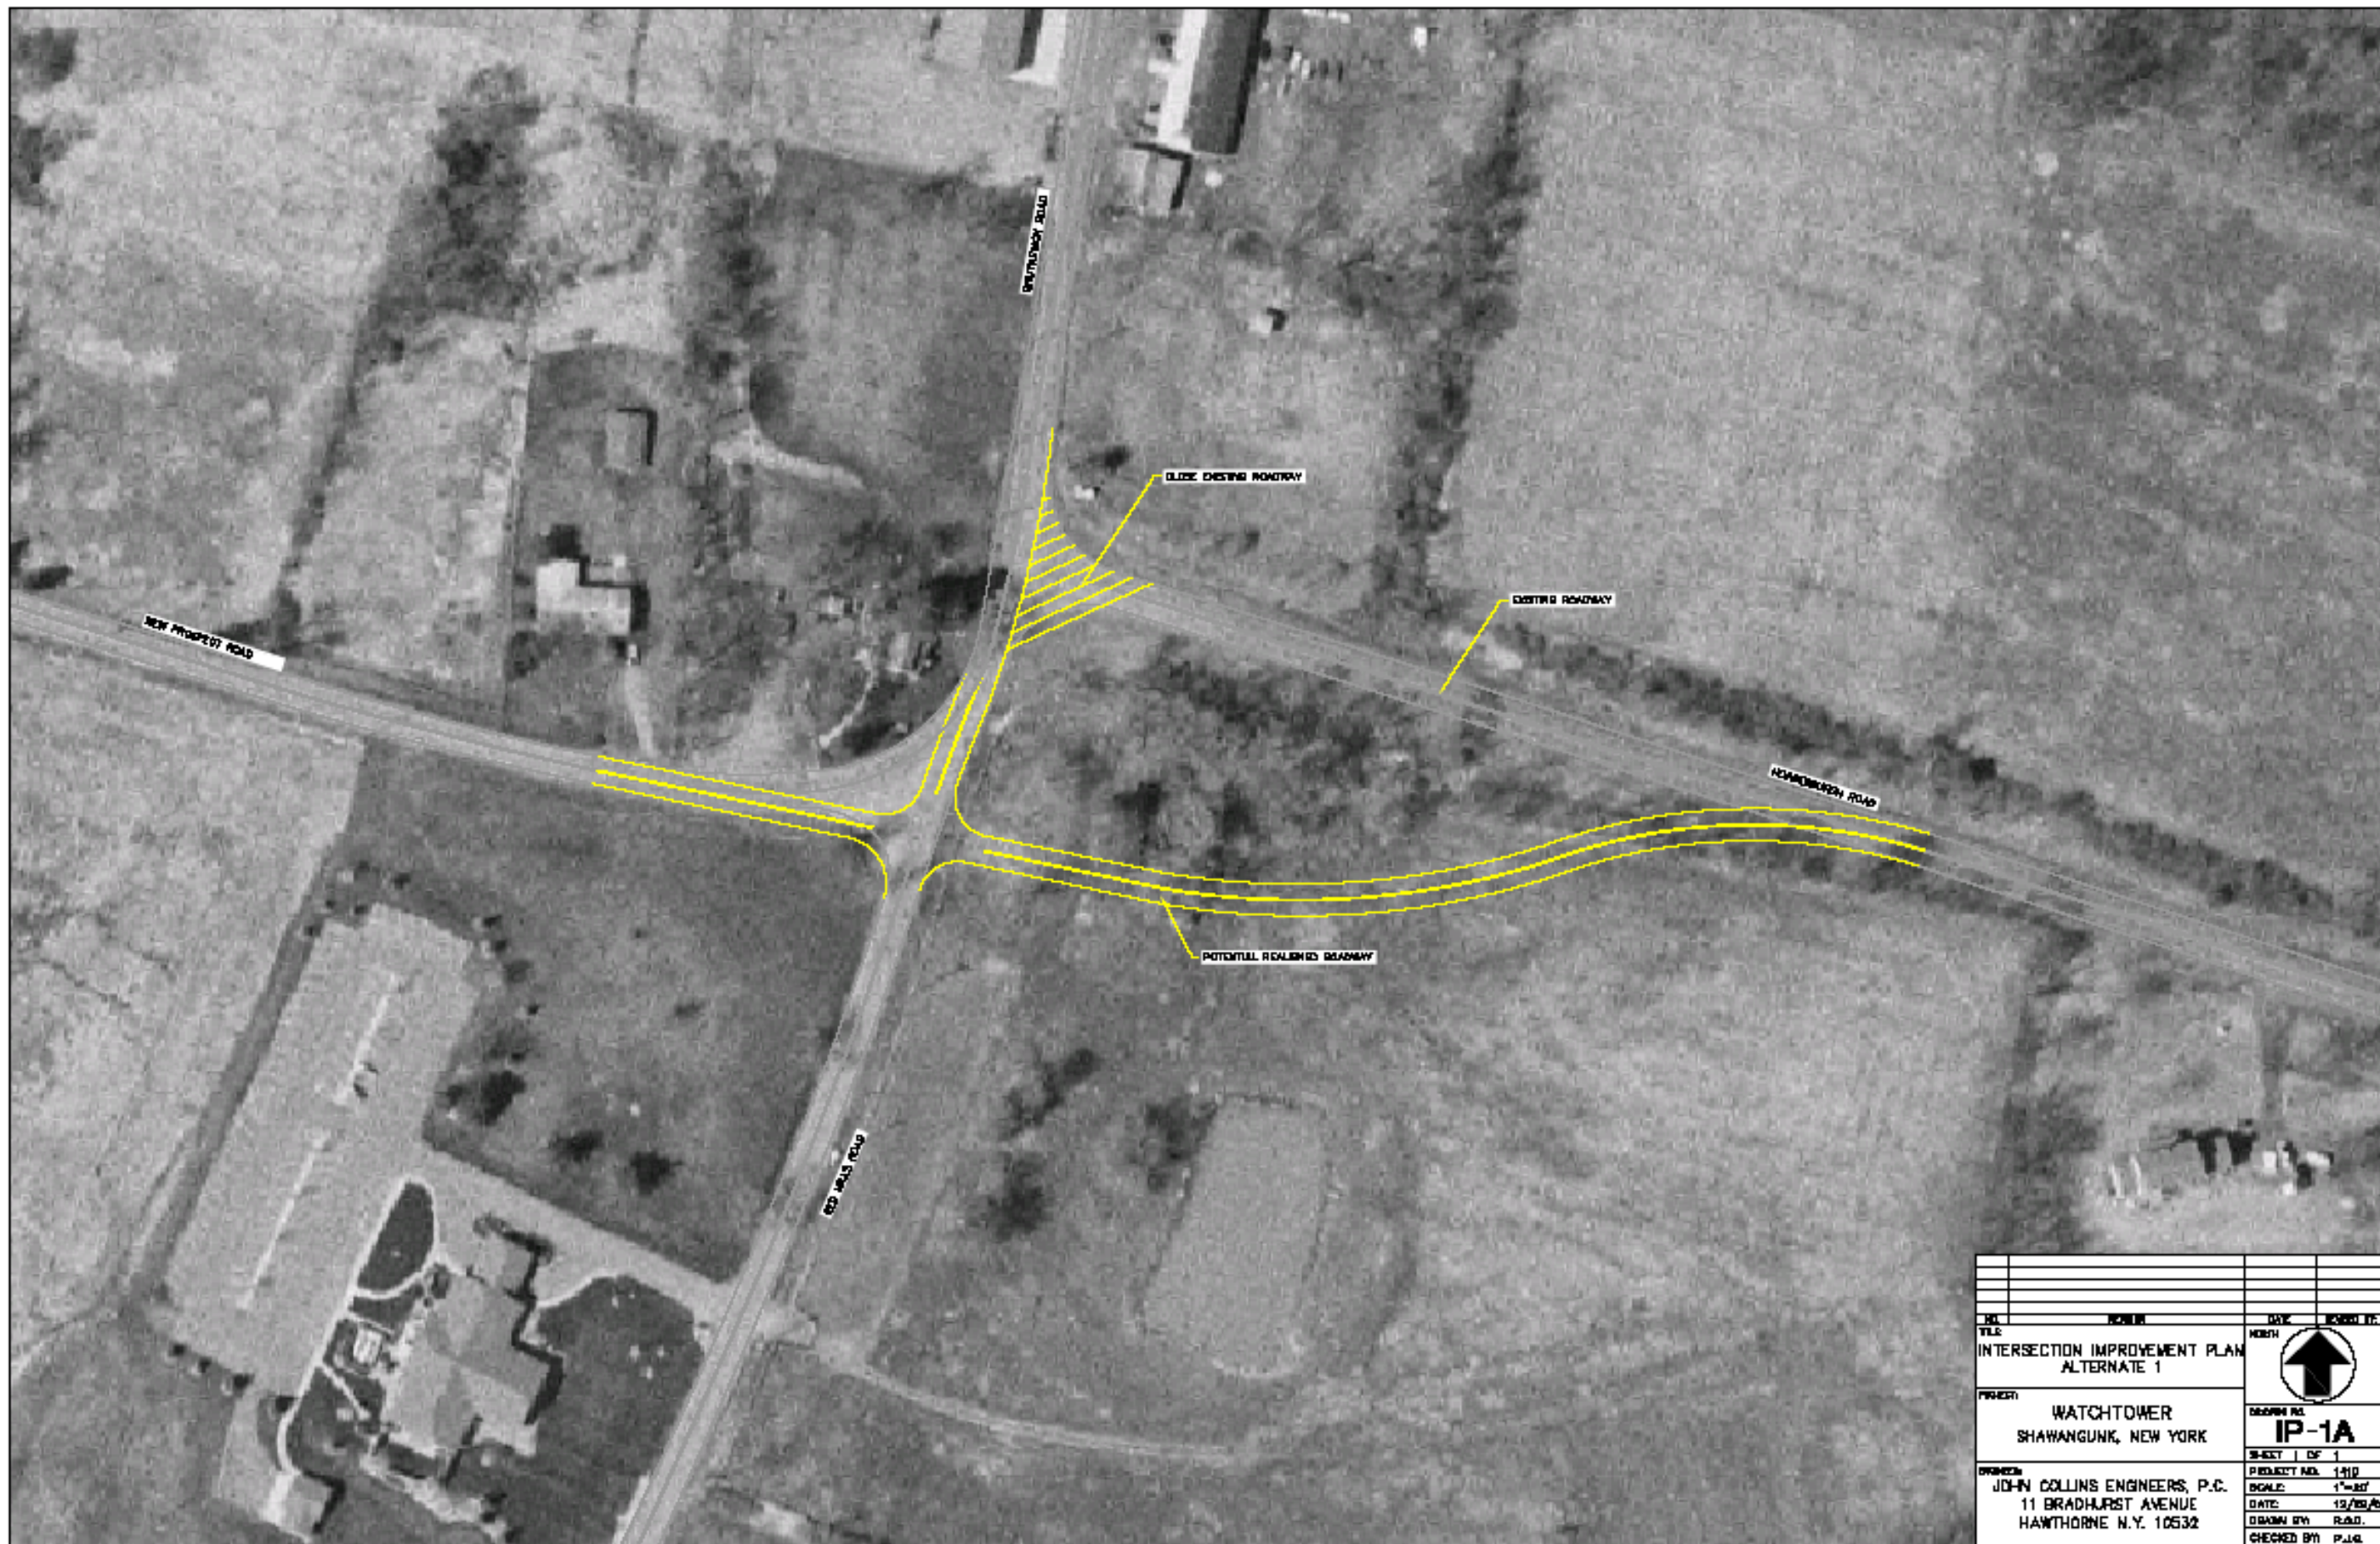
Intersection Improvement Plan Alternate 1A (IP-1A)
